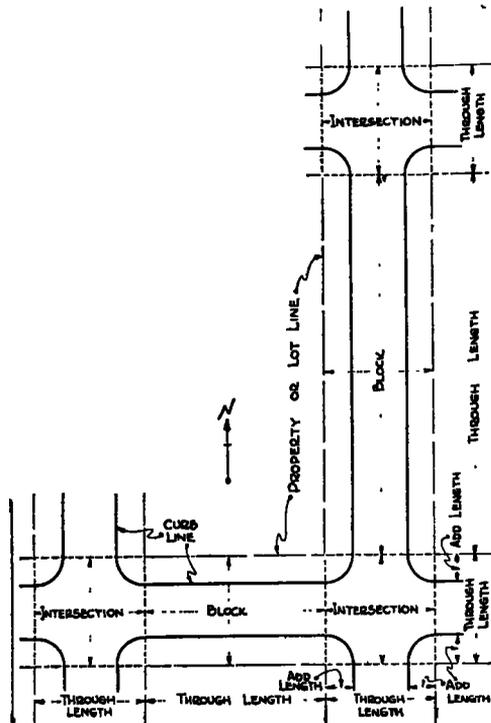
Sample Street Layout Showing Through and Add Lengths for Blocks and Intersections
